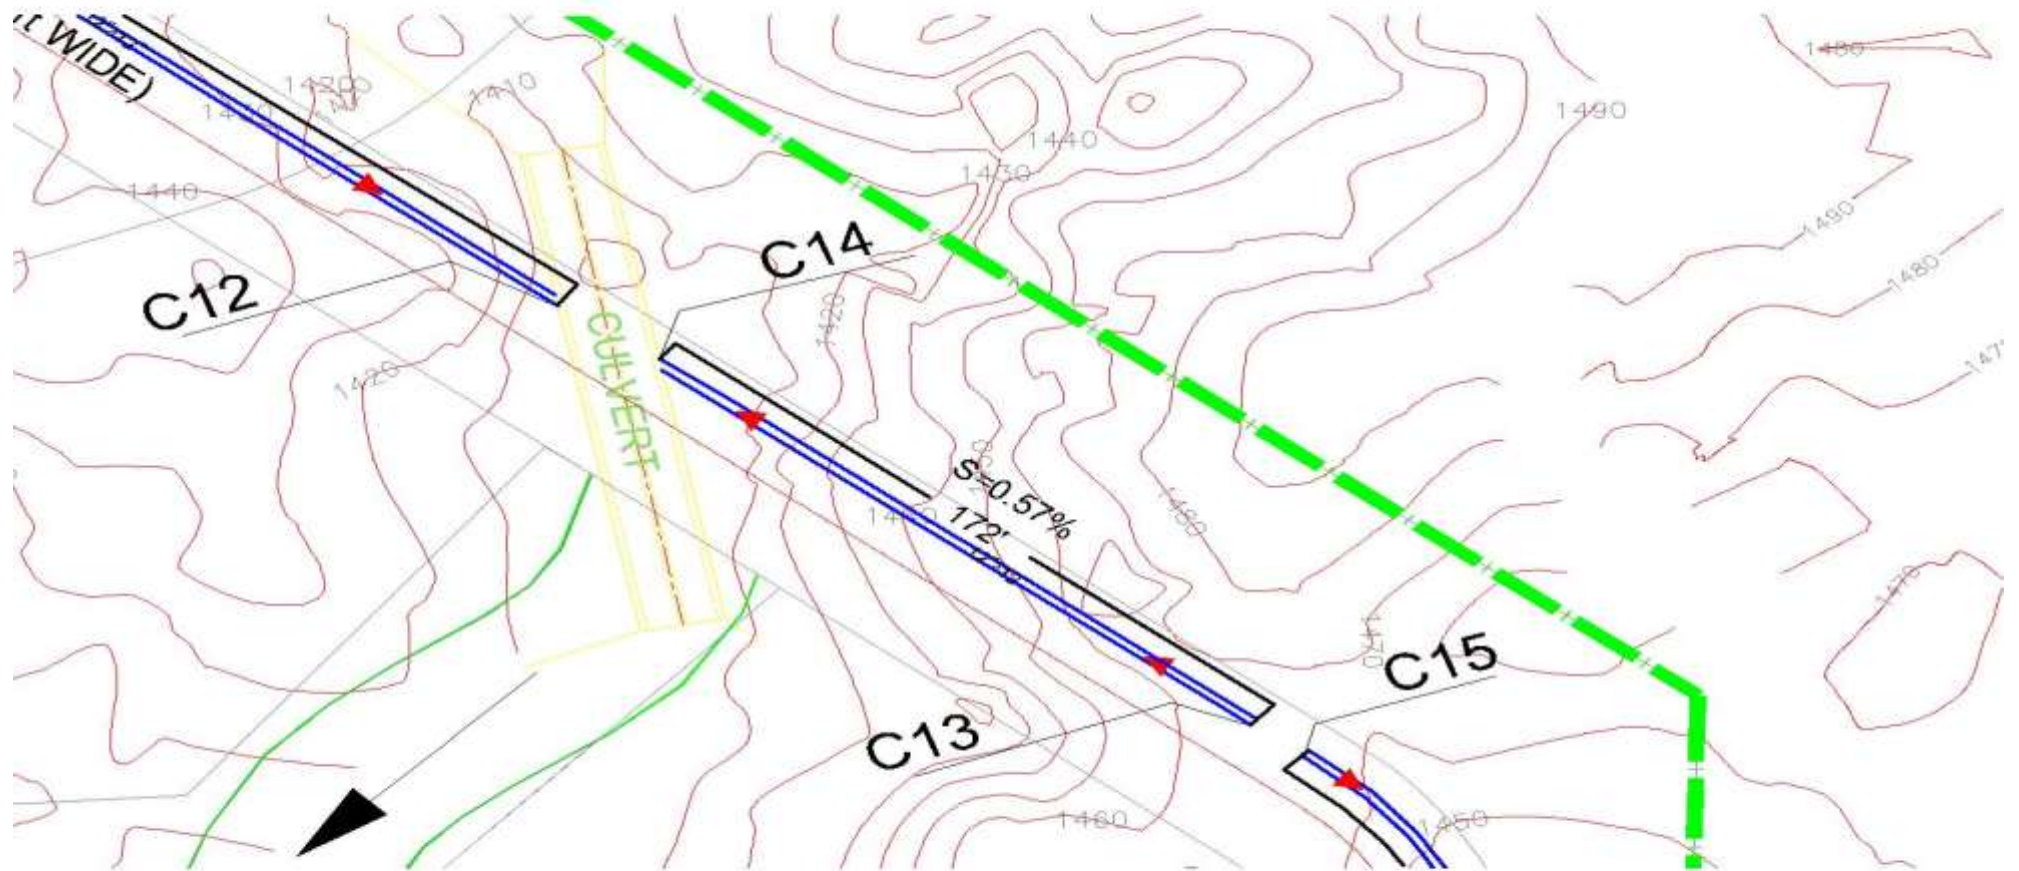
Storm drainage layout plan of Sub-catchment-15 showing final disposal node C14
